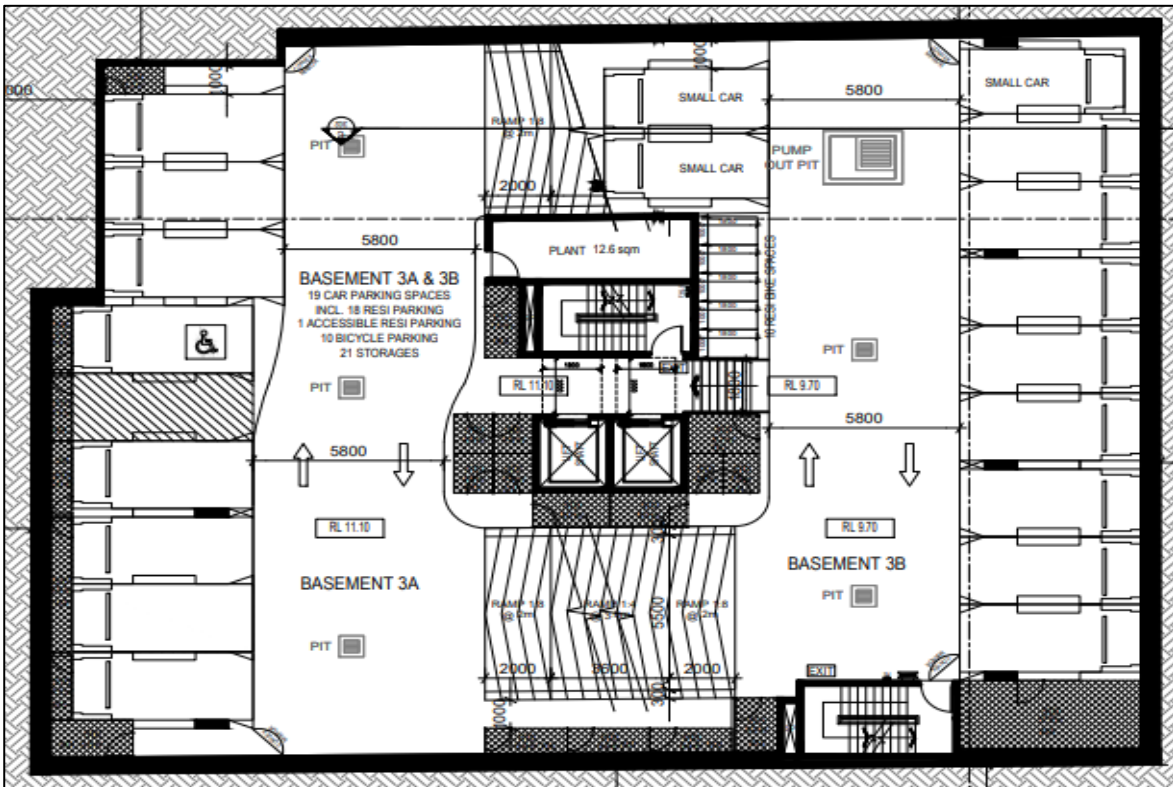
Extract of applicants submitted Basement Level 3 Plan.
